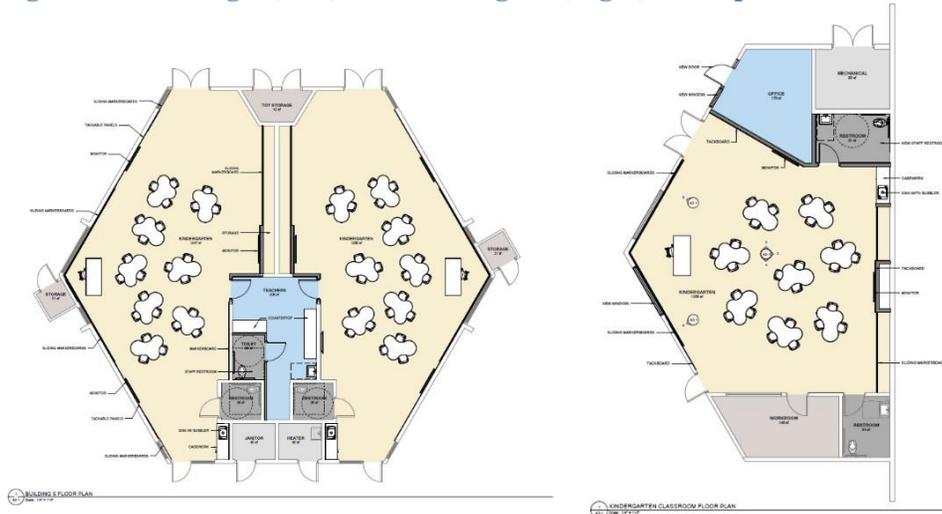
depict a sample preschool, TK and K classroom floor plans of new and modernized facilities designed to meet District specifications, Title 5 and Title 22 requirements for K, TK, and preschool classrooms.
